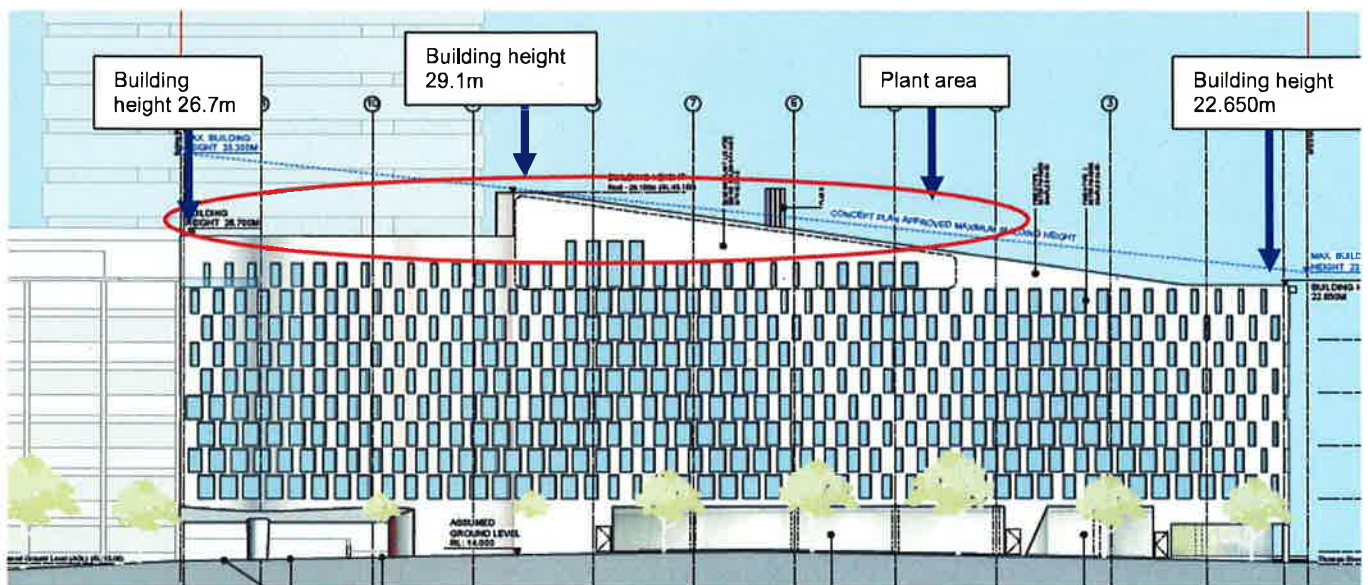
Thomas Street elevation (approved Concept Plan)
